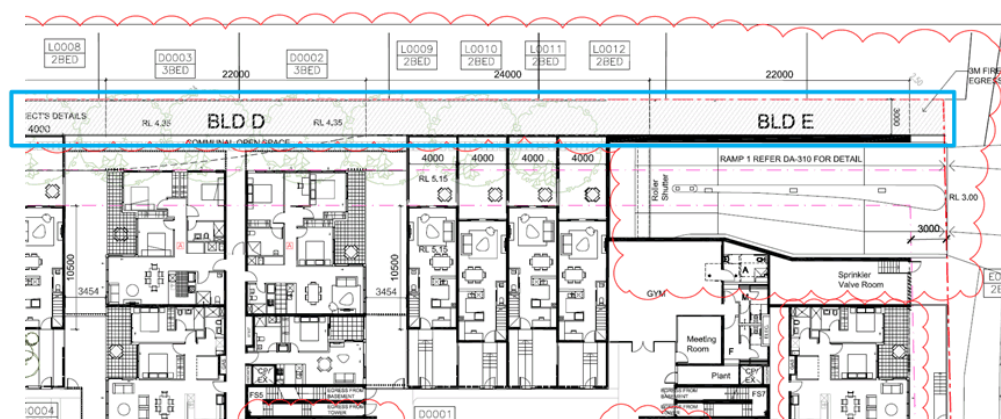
Ground Floor Plan illustrating licensed deed area (outlined blue) and northern portion of Building D
